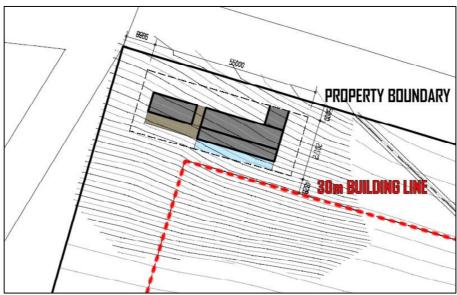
SITUATION OF THE PROPOSED FARM MANAGERS DWELLING
